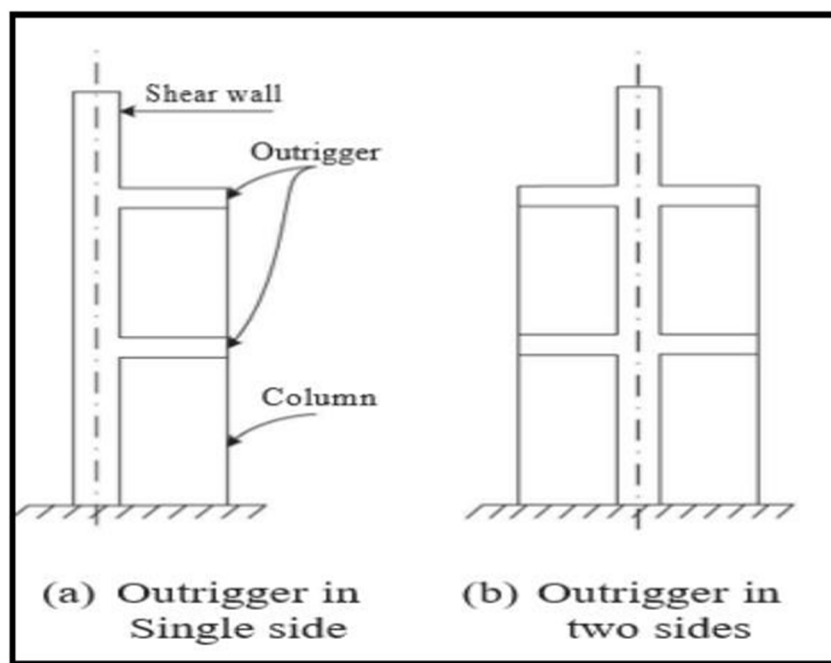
a) Outrigger in Single Side, b) Outrigger in Two Sides
